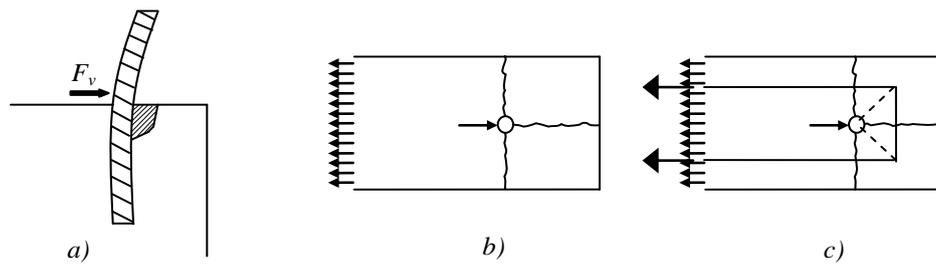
Splitting effects around a dowel pin loaded in shear, a) concrete splitting failure occurs at the opposite side of the load, b) possible risk of cracking, c) strut and tie model for design of splitting reinforcement. The figure is based on fib (2008).
